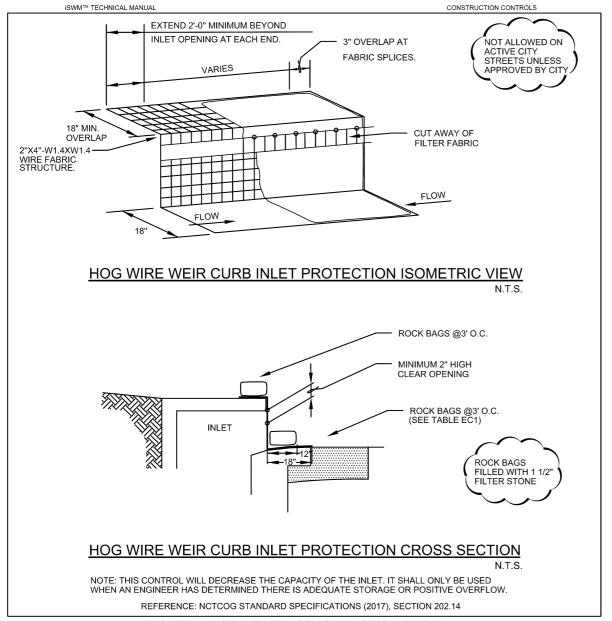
STANDARD CONSTRUCTION DETAIL -HOG WIRE WEIR CURB INLET PROTECTION (1 OF 2)
